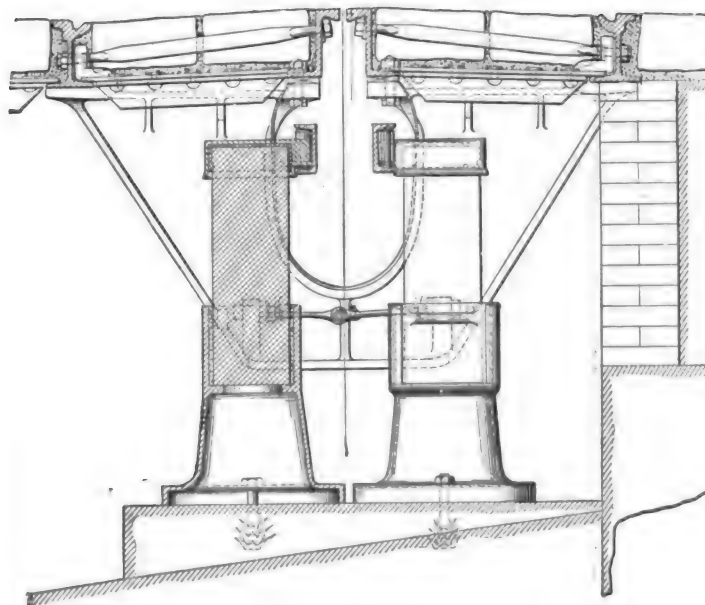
SECTION OF CONDUIT—PEDESTAL SUPPORT.
